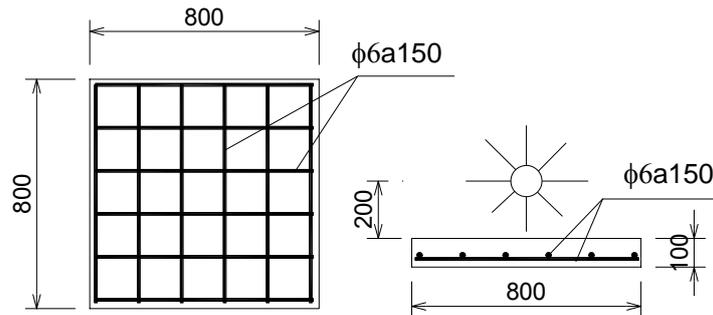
FRP-reinforced coral concrete panel subjected to blast loading.
